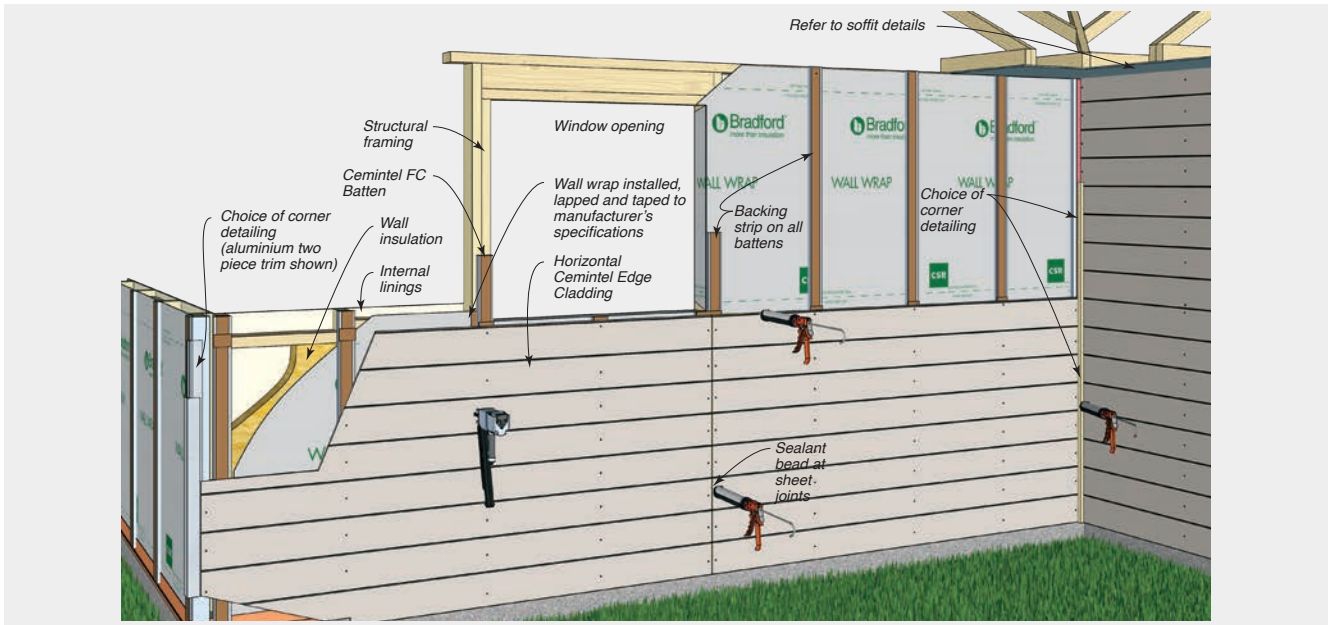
Typical Cavity Fix Cladding to Batten – Vertical Joint
